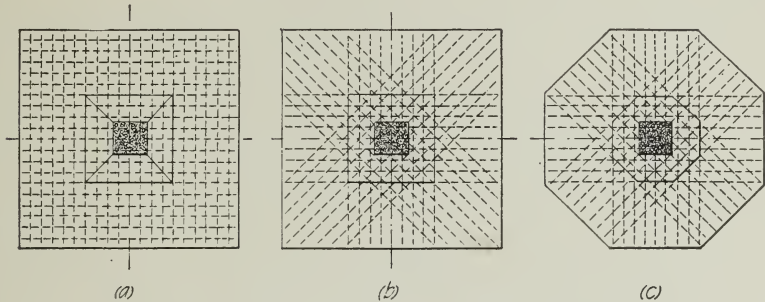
Different Arrangements of Rods in Reinforced Concrete Footings.
